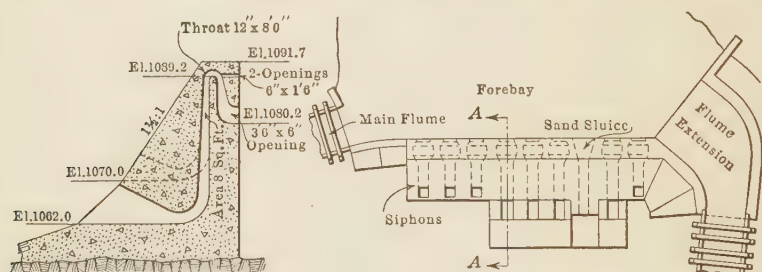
Cross-sectional elevation and plan of siphonic spillway for hydro-electric plant, Tennessee Power Co. (*Eng. Rec.*, May 16, 1914.)
